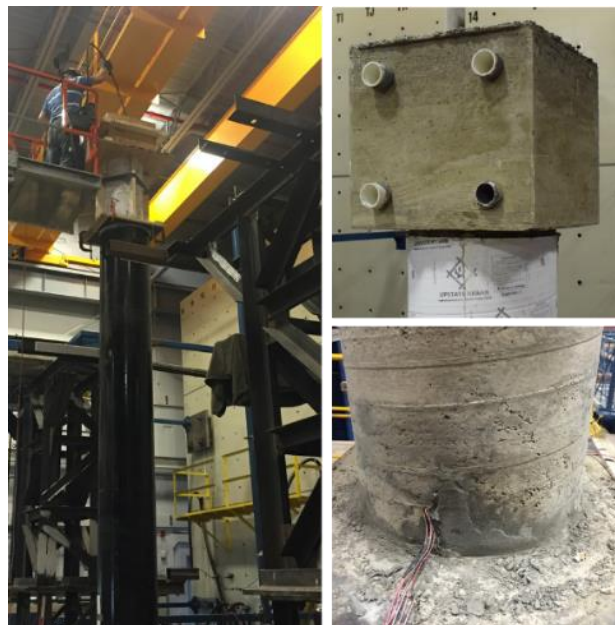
Self-consolidating concrete poured in the foundation and RCFST shaft part.
